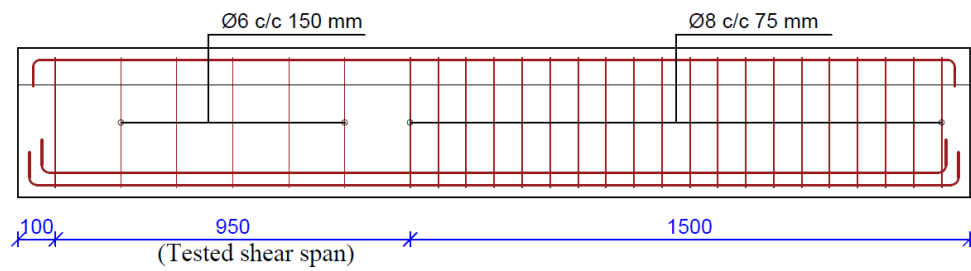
d show the geometric and reinforcement details of the T-section beams. The beams had an overall length of 2550 mm and web and flange cross-sectional dimensions of 180 × 300 mm and 450 × 100 mm, respectively. The test beams were under-reinforced in shear within the test region to promote shear failure prior to flexural failure. The internal transverse reinforcement within the shear span was comprised of either none, 6 mm steel stirrups spaced at 300 mm, or 6 mm steel stirrups spaced at 150 mm, as shown in Figure 2.2a–d.
